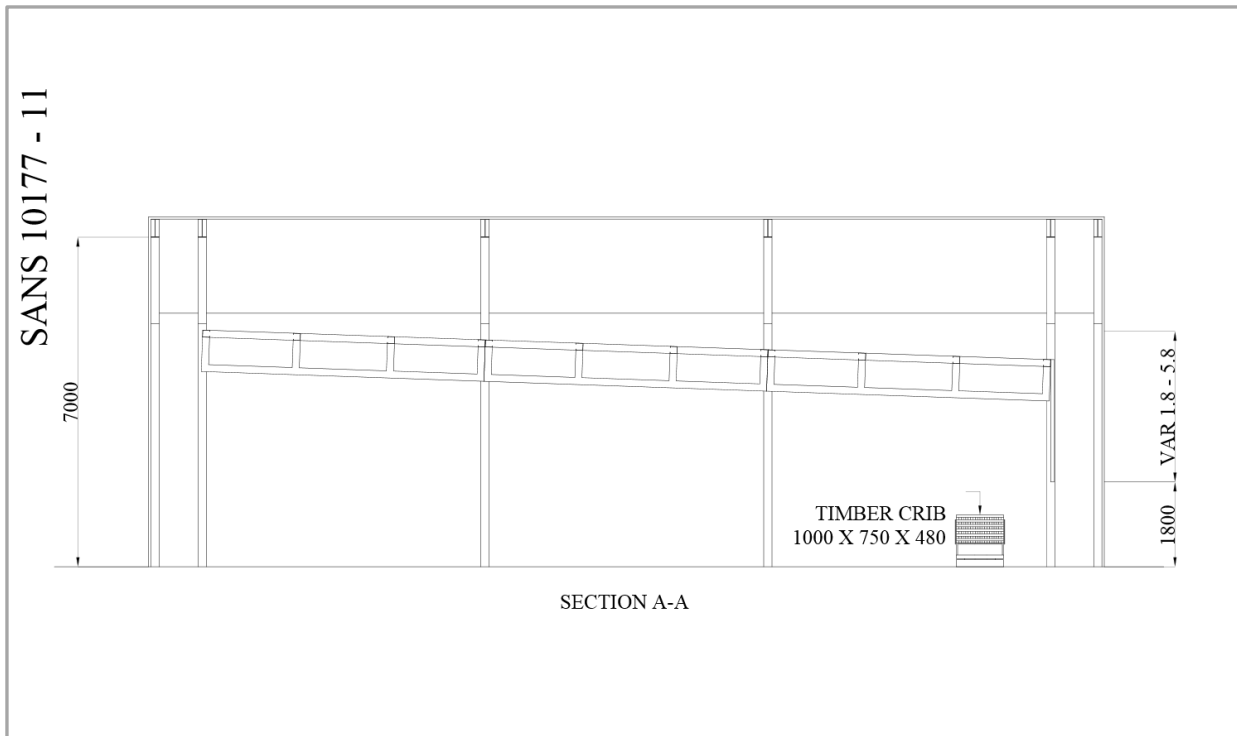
Typical roof test installation in the SANS 10177 – Part 11 facility
